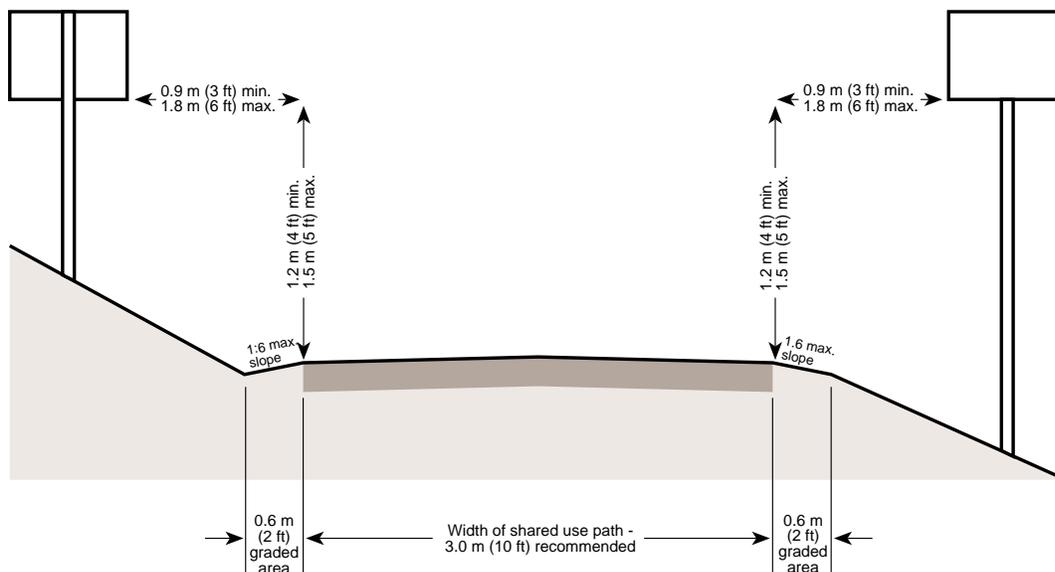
Cross Section of Two-Way Shared Use Path on Separated Right-of-Way
